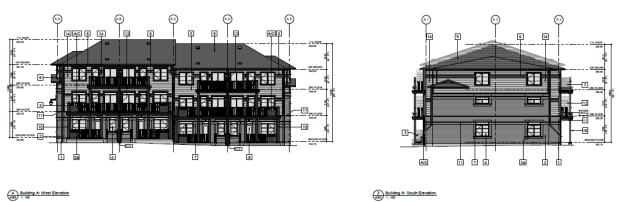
Proposed townhouse elevations. (Source: Fusion Homes, 2023)
